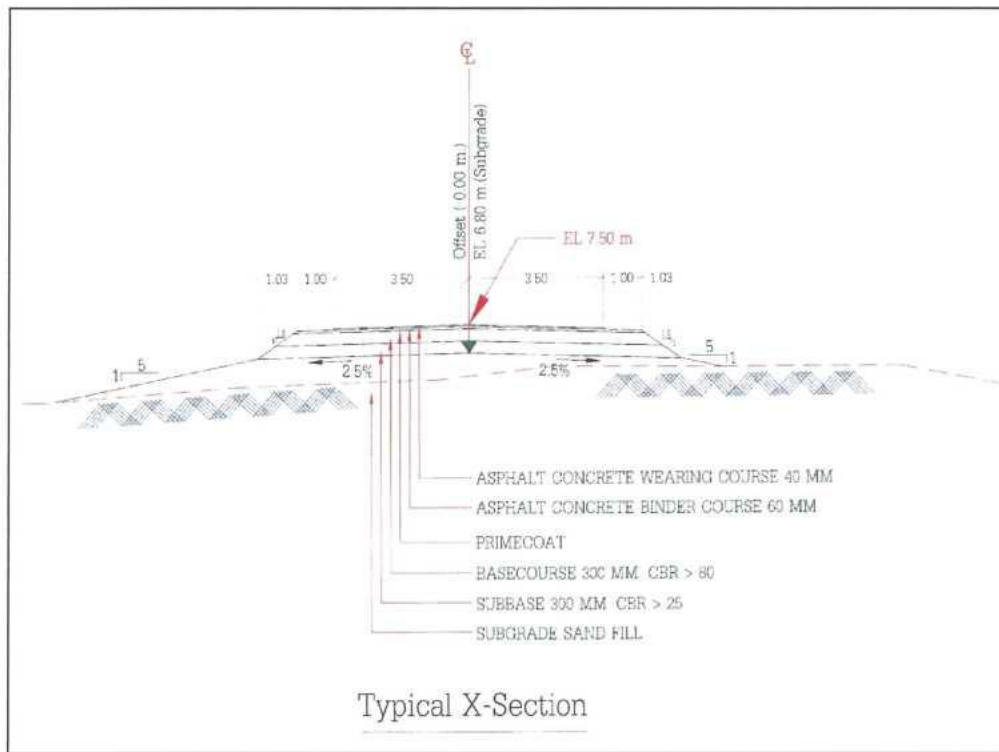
LAYOUT OF THE PROJECT COASTAL ROAD
